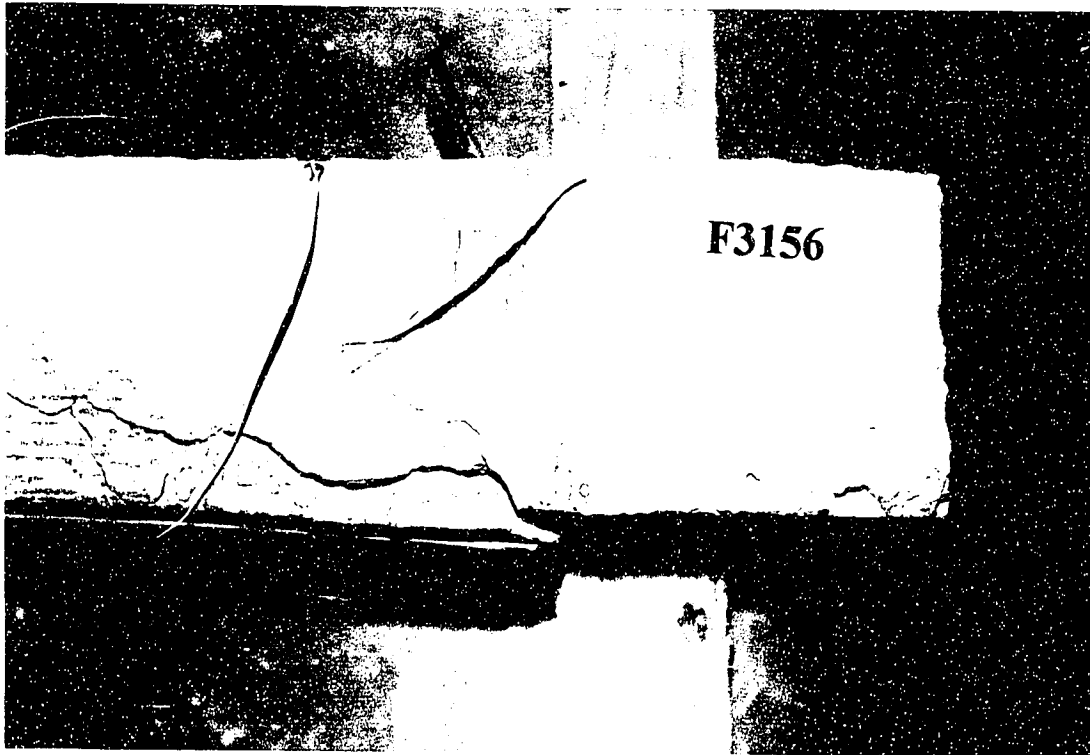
Photograph showing the mode of failure for beam F3156 strengthened by 3 mm thick, 100 mm wide and 900 mm long plate with 60 mm c/c spacing of stirrups
